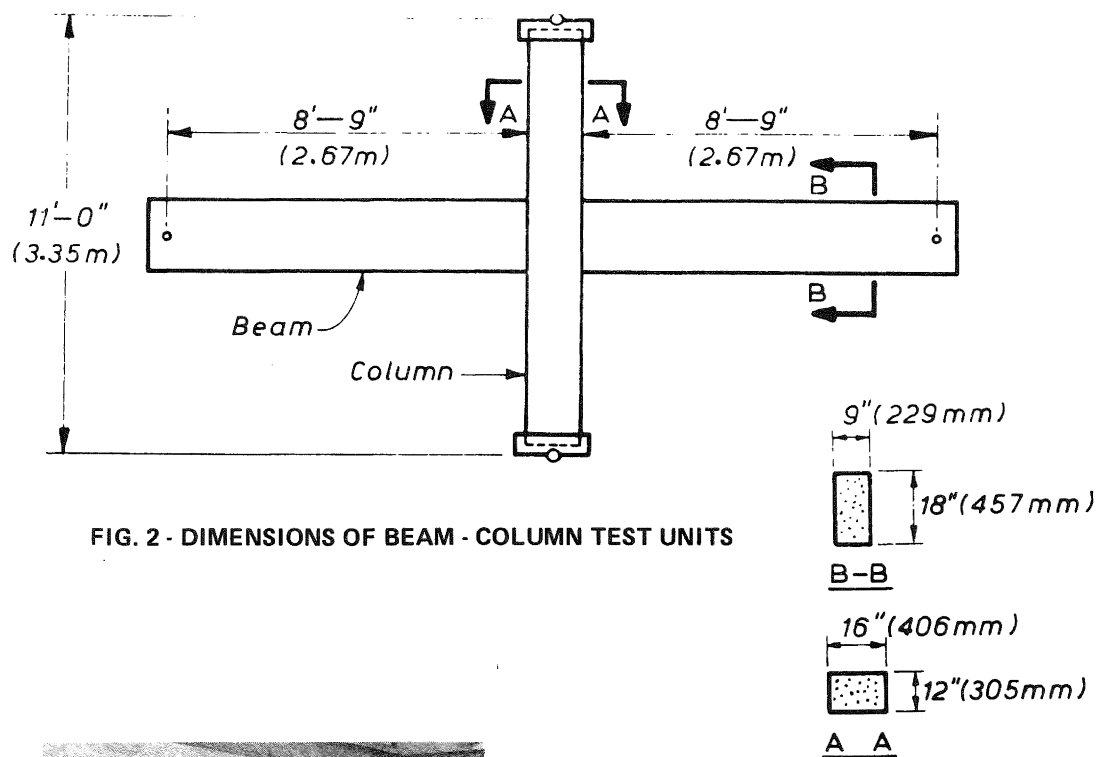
DIMENSIONS OF BEAM - COLUMN TEST UNITS
